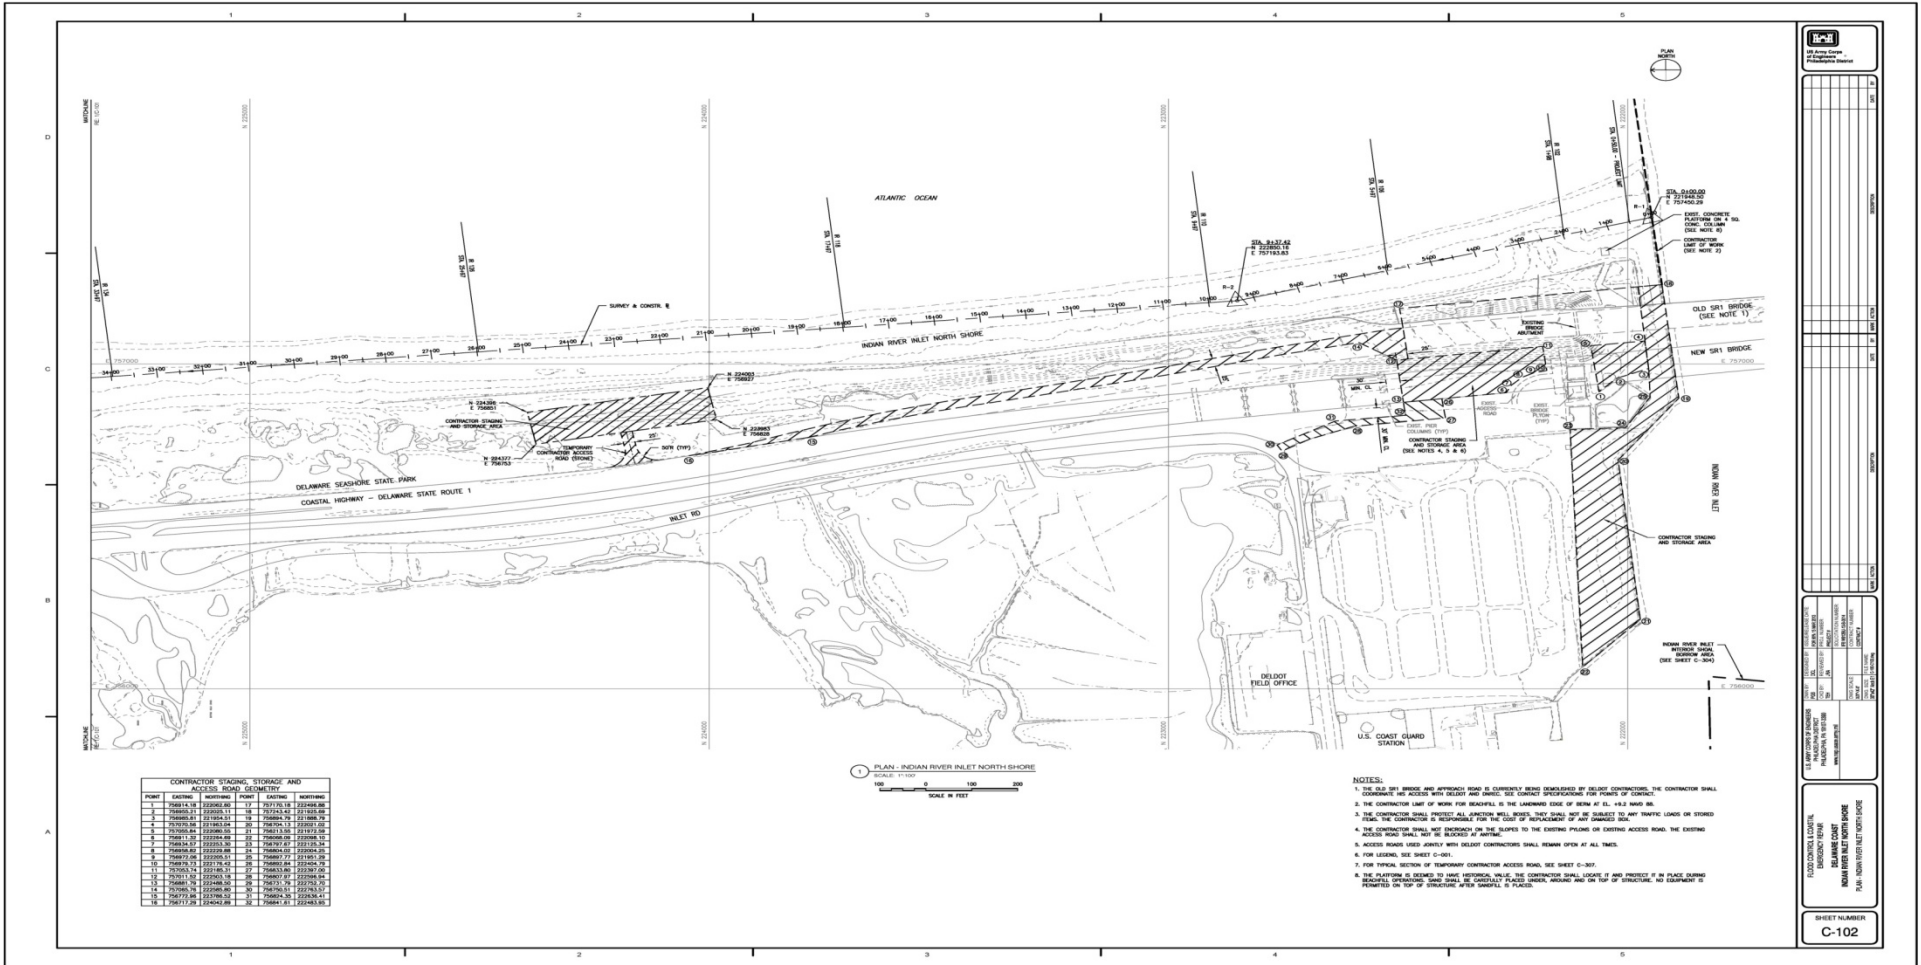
Indian River Inlet North Shore Beachfill Plan (southern end).
